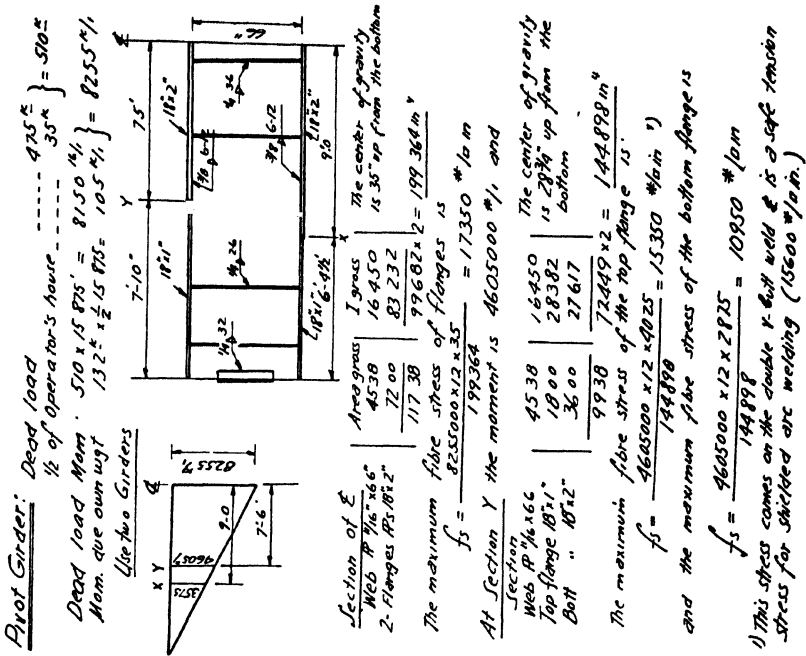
(right). Pivot girder for welded truss of swing bridge.
